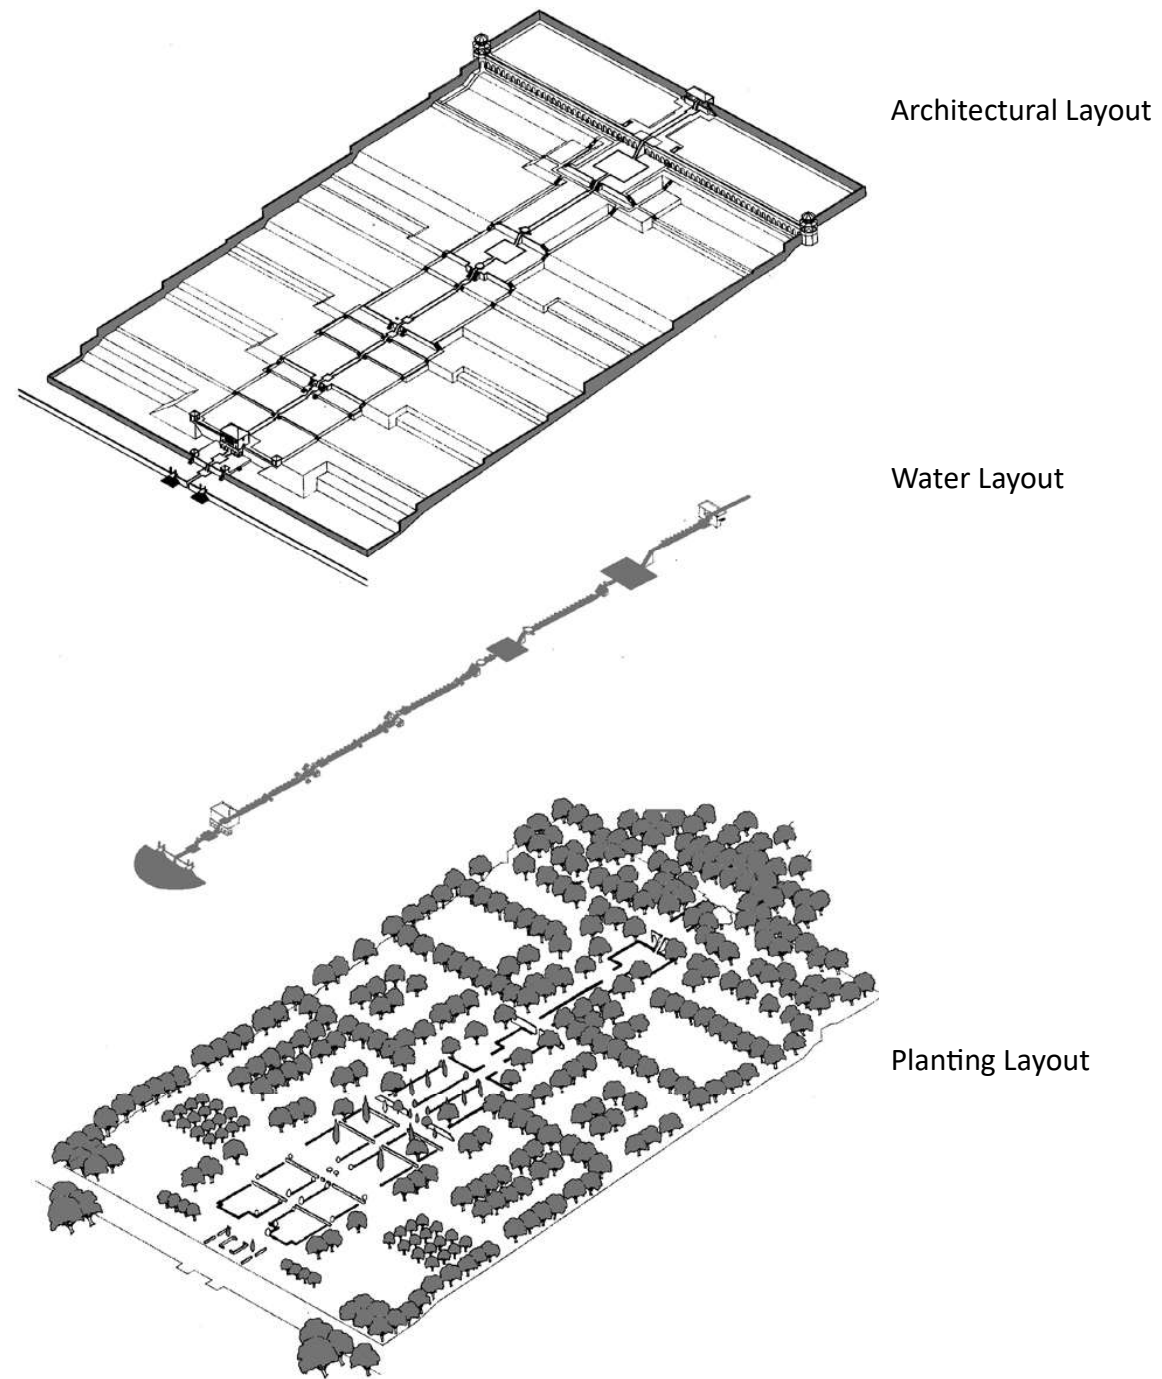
Structure of the Persian garden. Showing: Planting layout, Water layout, Architectural layout
